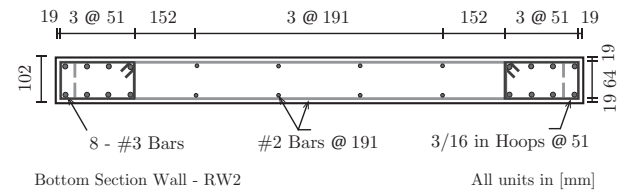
Reinforcement details of specimen wall RW2, which was used by Thomsen and Wallace [64] in 1995.
